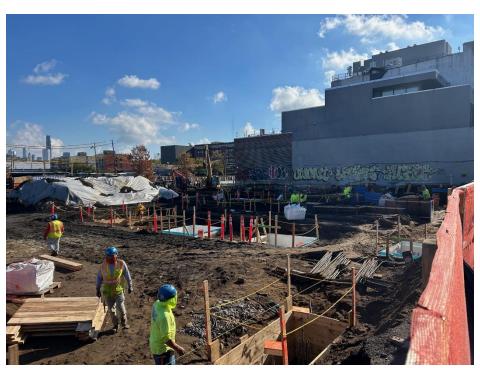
ECD installing formwork for pile caps in the western part of the site (facing southeast)
